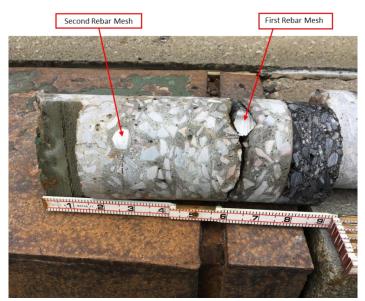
Area 1, L4 4in Core That Missed the Steel Girder. First and Second Rebar Meshes Can Be Clearly Seen. (Ruler in tenths of feet)
